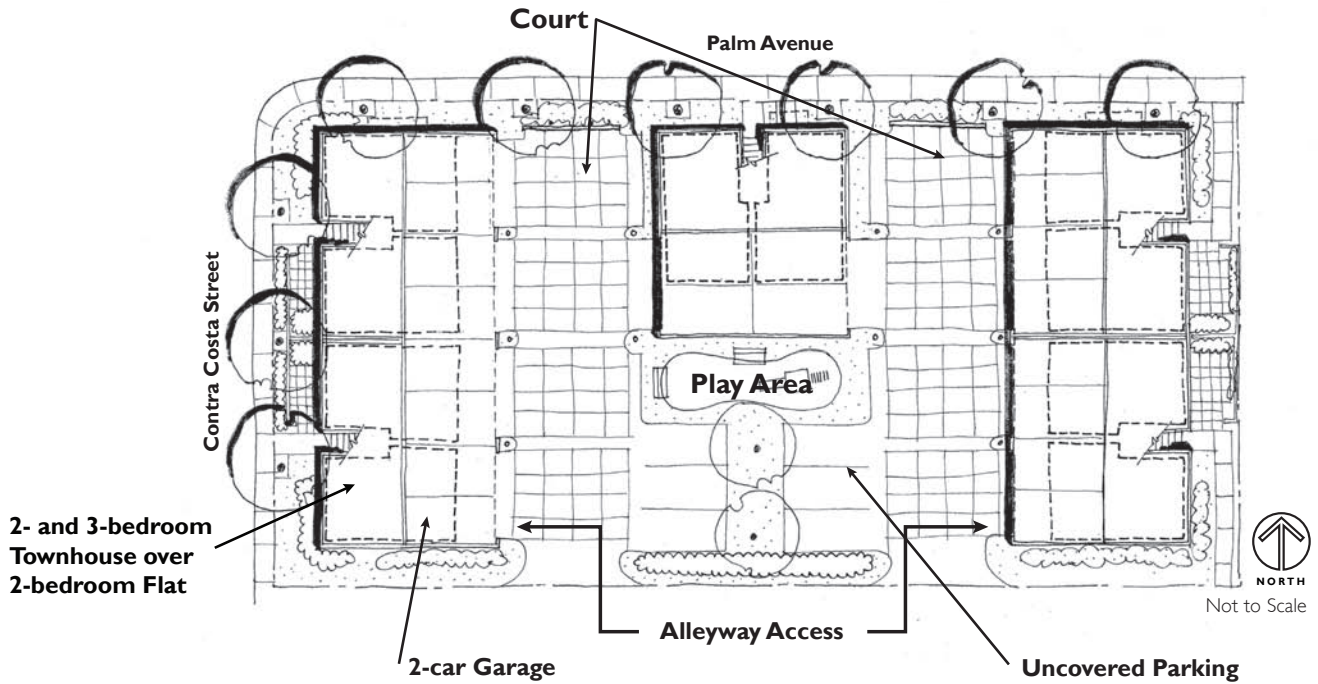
Residential Project Concept A, Plan View (for illustrative purposes only)
